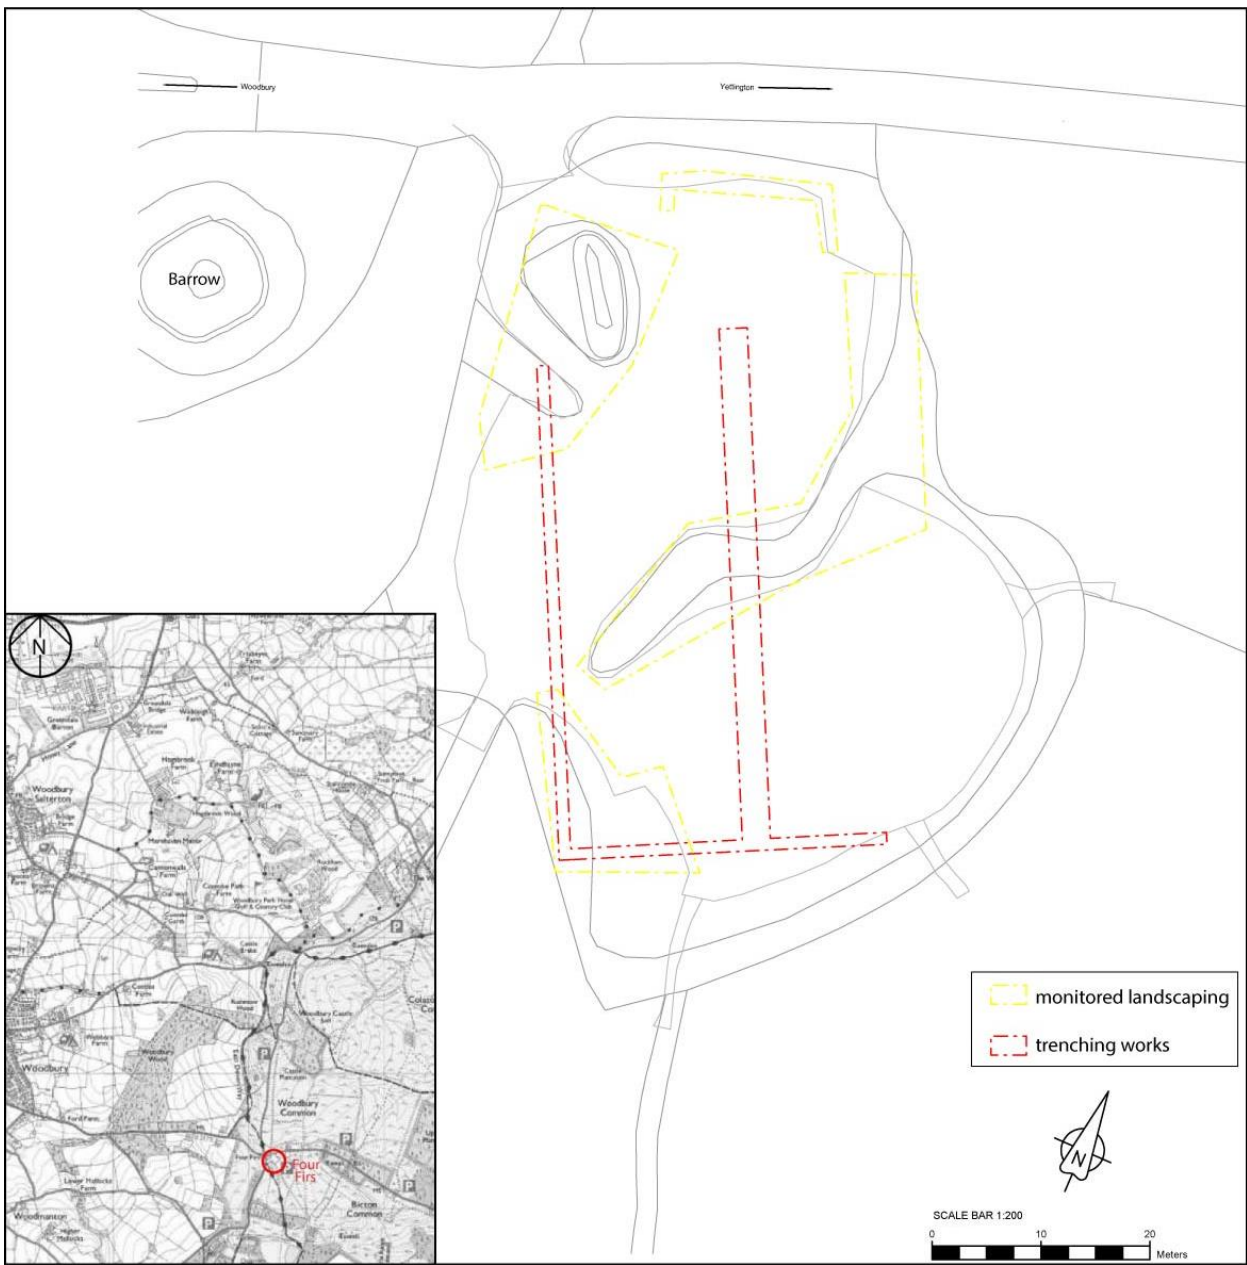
LOCATION PLAN, SHOWING AREAS OF MONITORED WORKS OVERLAID ON ARCHITECTS PLAN.
